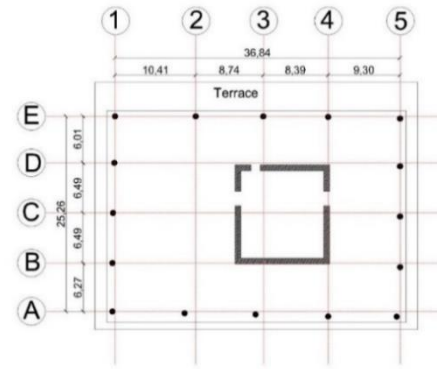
Architectural Plan of the 20th Floor (units are in m)
